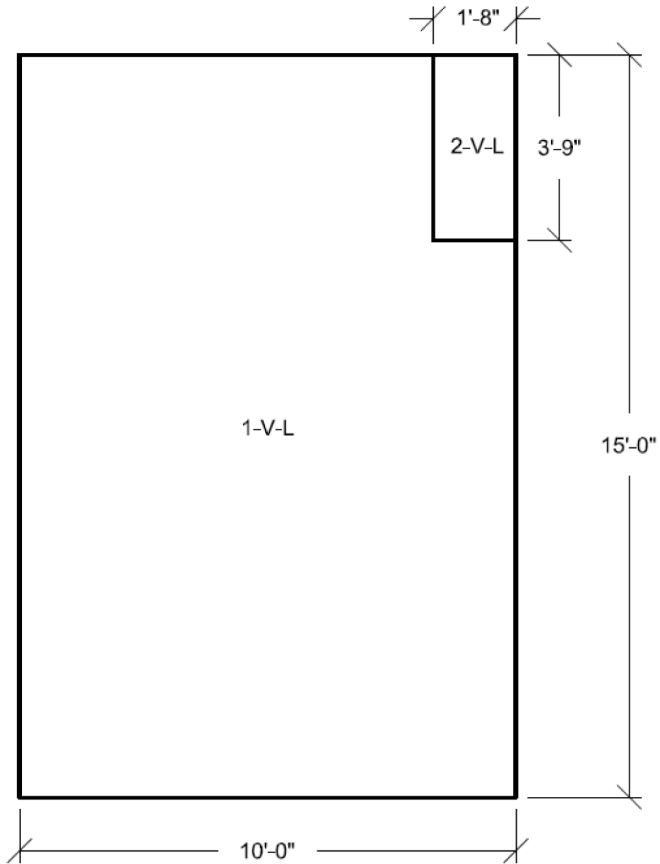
H.6-205 DGFOV Wall 16 Looking From Outside
